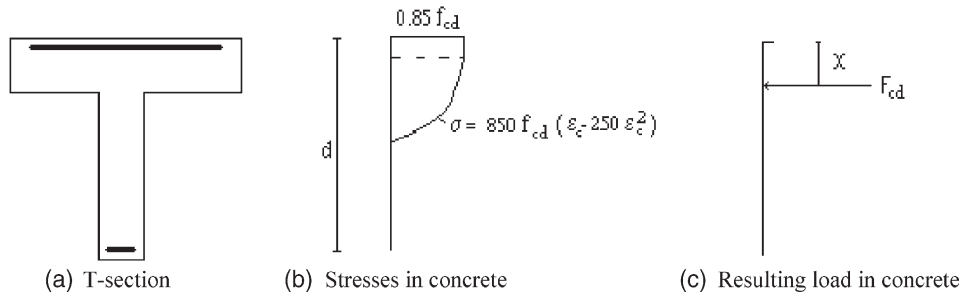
(a) T-section; (b) stresses in concrete; (c) resulting load in concrete.
